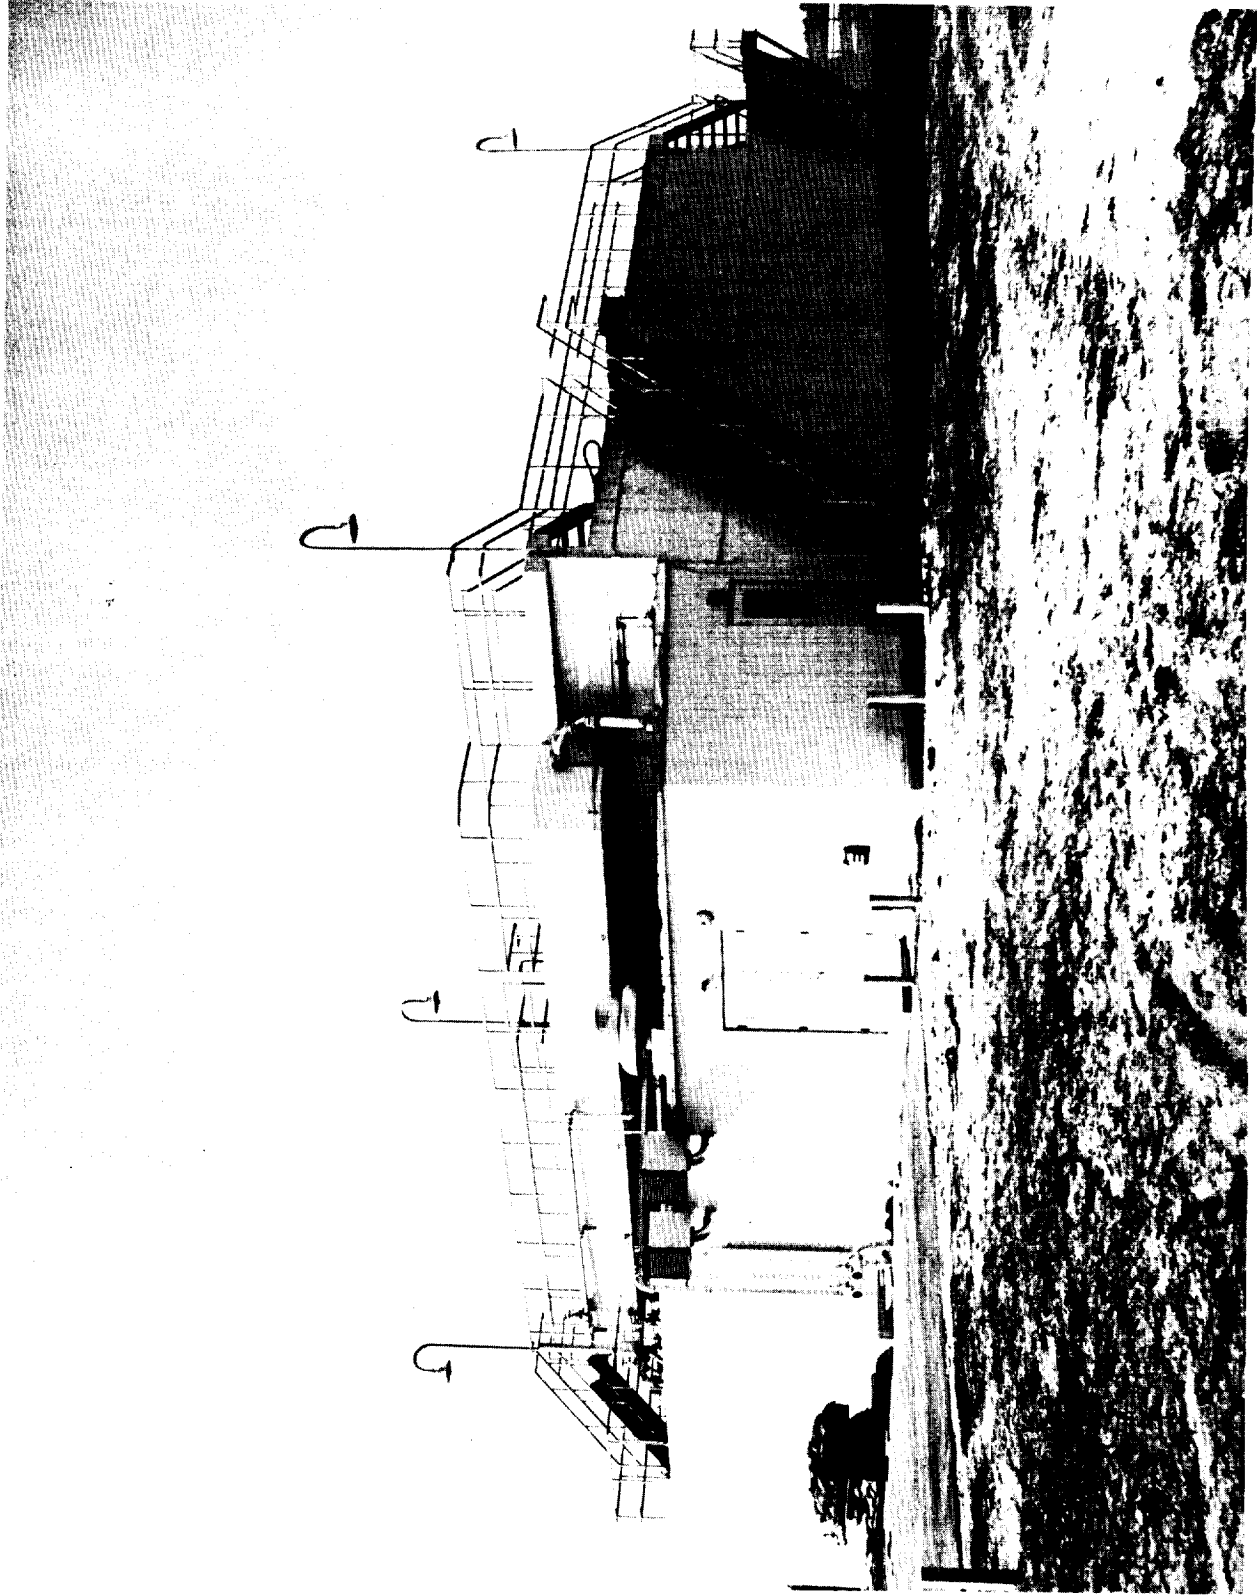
Launch Complex 39 , Assembly Area Sewage Treatment Plant
